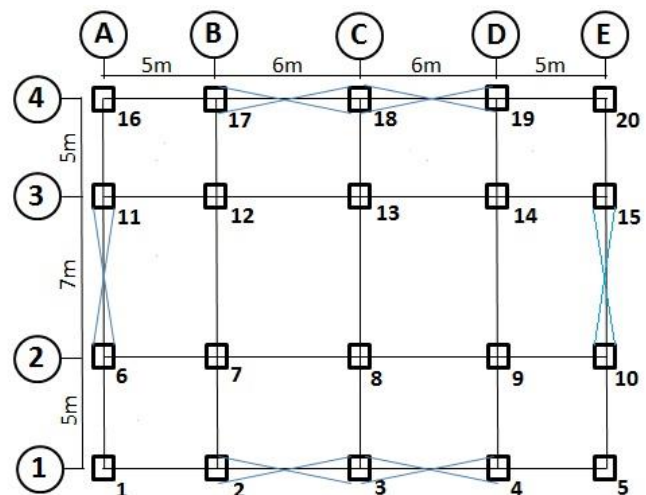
Plan of building with moment-resisting frames and moment-resisting braced frames.
